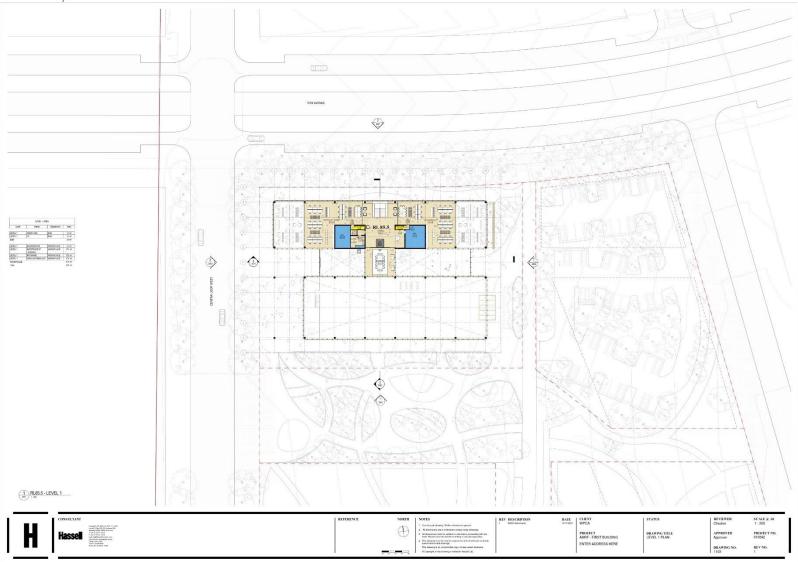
AMRF – First Building level 1 plan (Architectural drawings prepared by Hassell, 2021).
